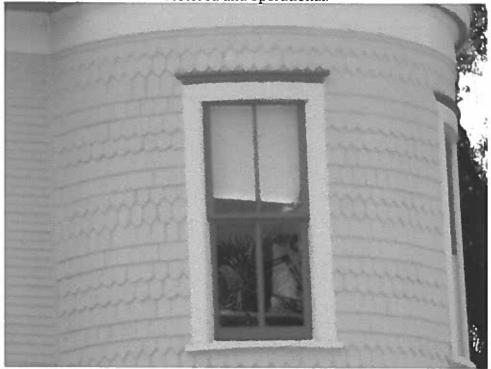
Window of the 2nd floor turret facing east. Panes were broken and window was paint shut. Now restored and operational.
